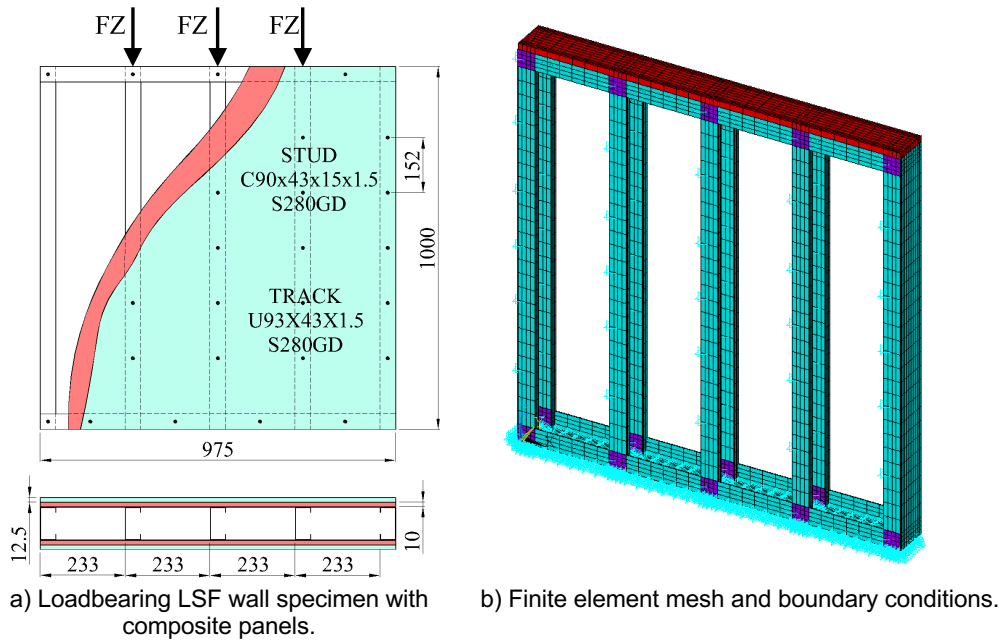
Loadbearing LSF wall. Geometric and finite element model.
